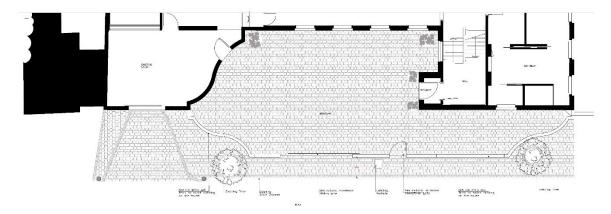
Proposed Part Plan of the driveway showing the new wall and gate. The curve of the wall has been designed to be visually subtle and respect the existing trees that surround the site.
